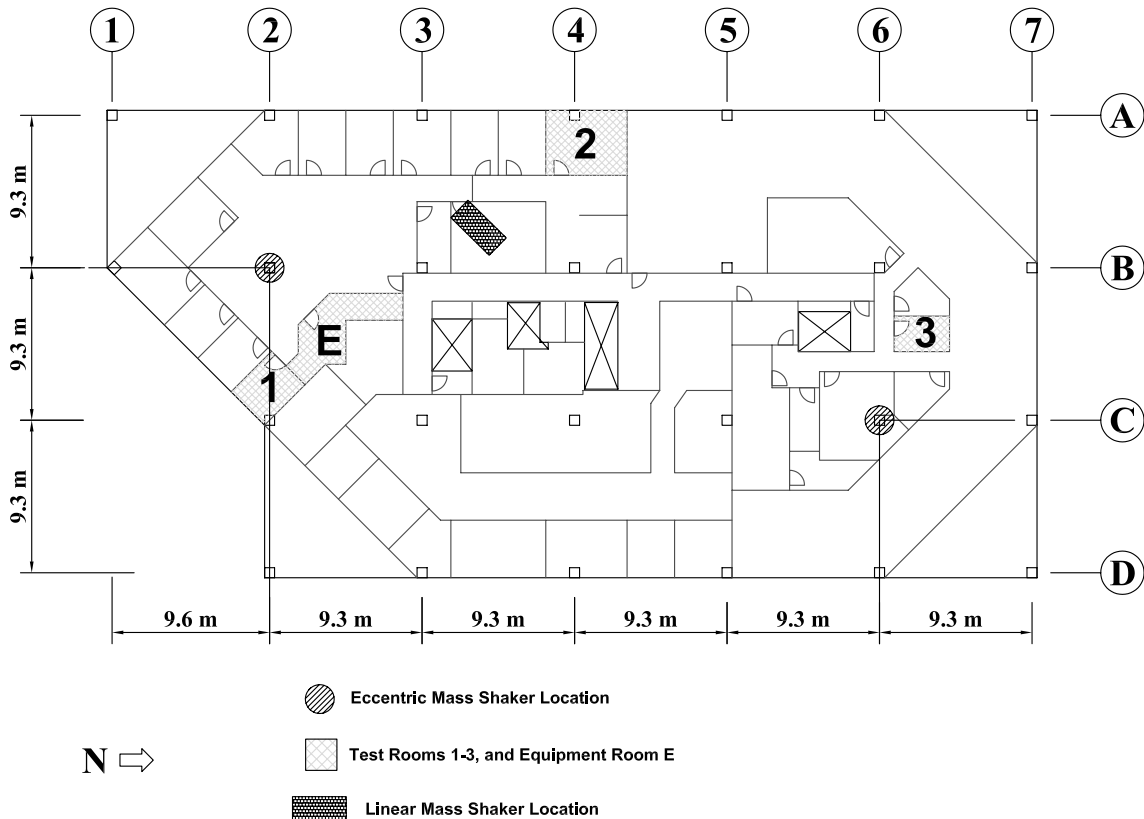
Plan view of the Fourth Floor in the Four Seasons Building.
